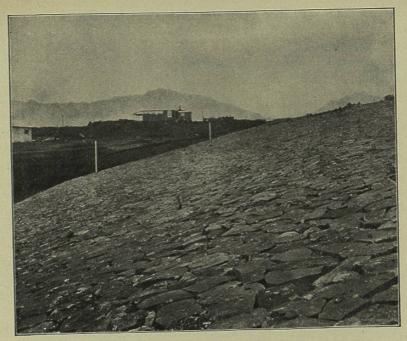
Rip-rap on Face of Hydraulic-fill, Waialua Dam.
